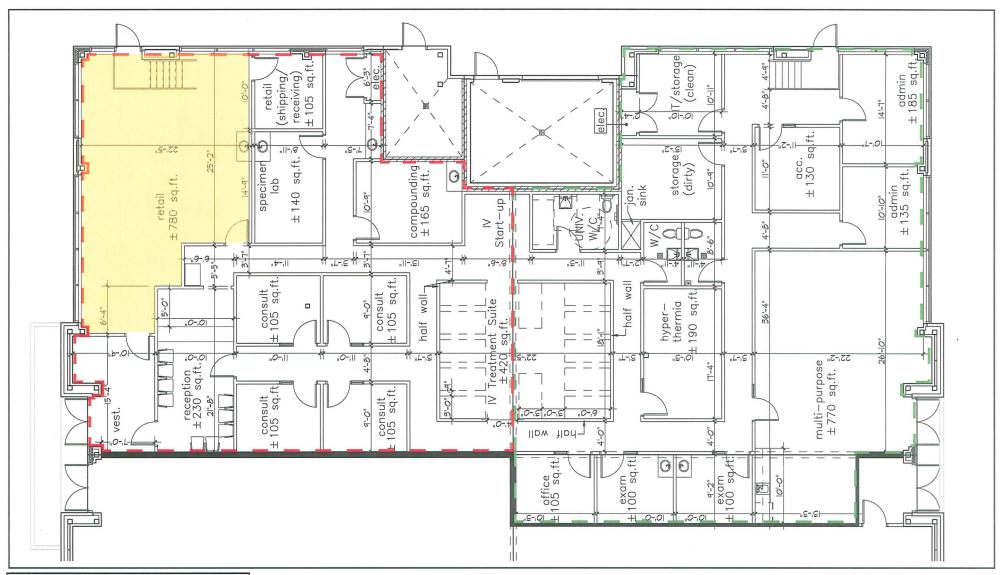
SITE PLAN BY A. BALDASSARRA ARCHITECT INC. - 2013 9131 KEELE ST. VAUGHAN
